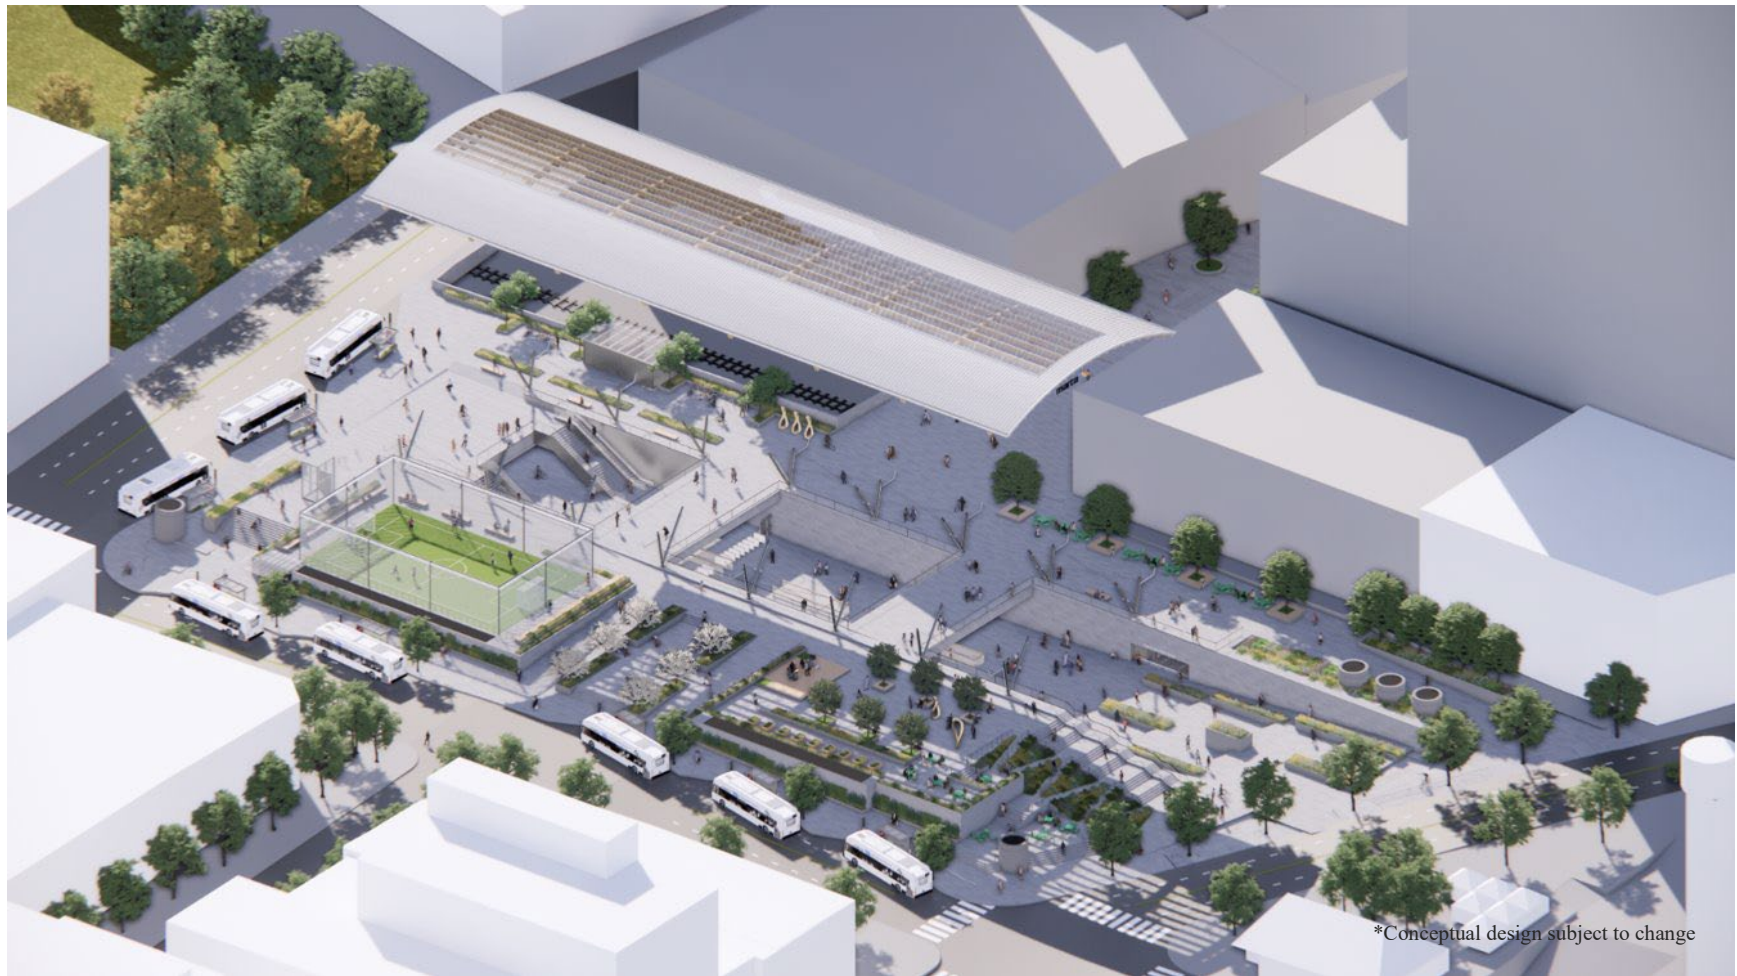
PROPOSED PROJECT PLAZA RECONFIGURATION
